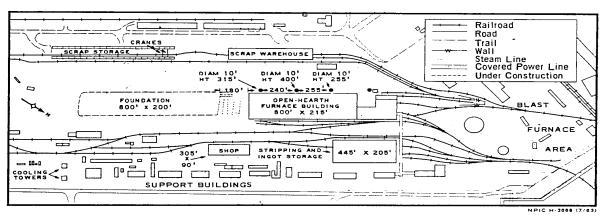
LAYOUT OF OPEN-HEARTH FURNACE SECTION.
